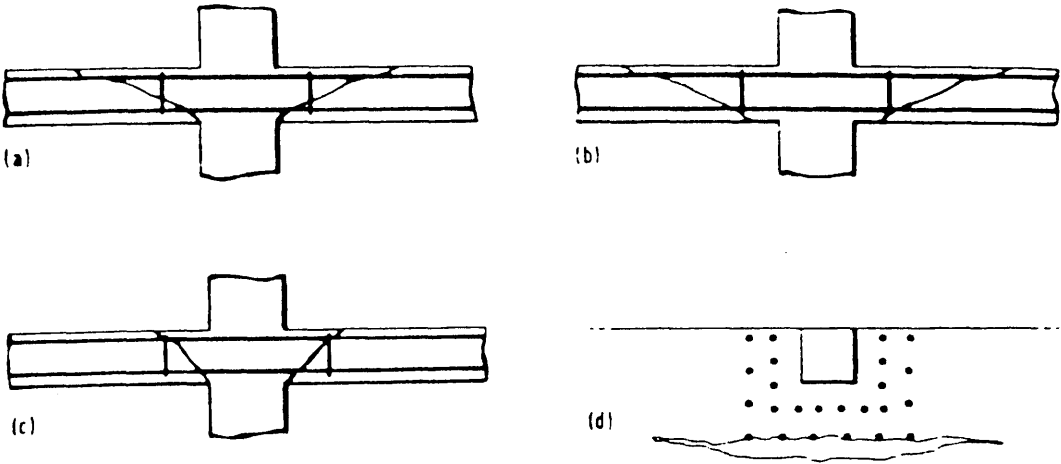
Possible modes of shear failures for slabs with shear reinforcement.
